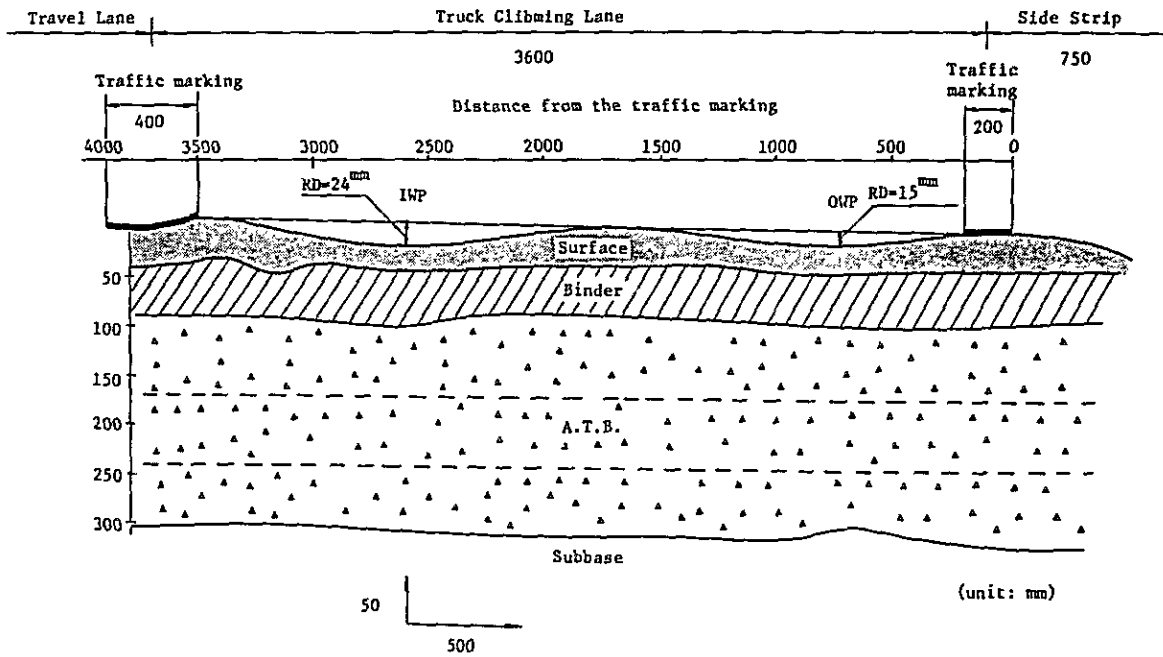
Cross Section of Rutted Pavement on the Tomei Expressway
